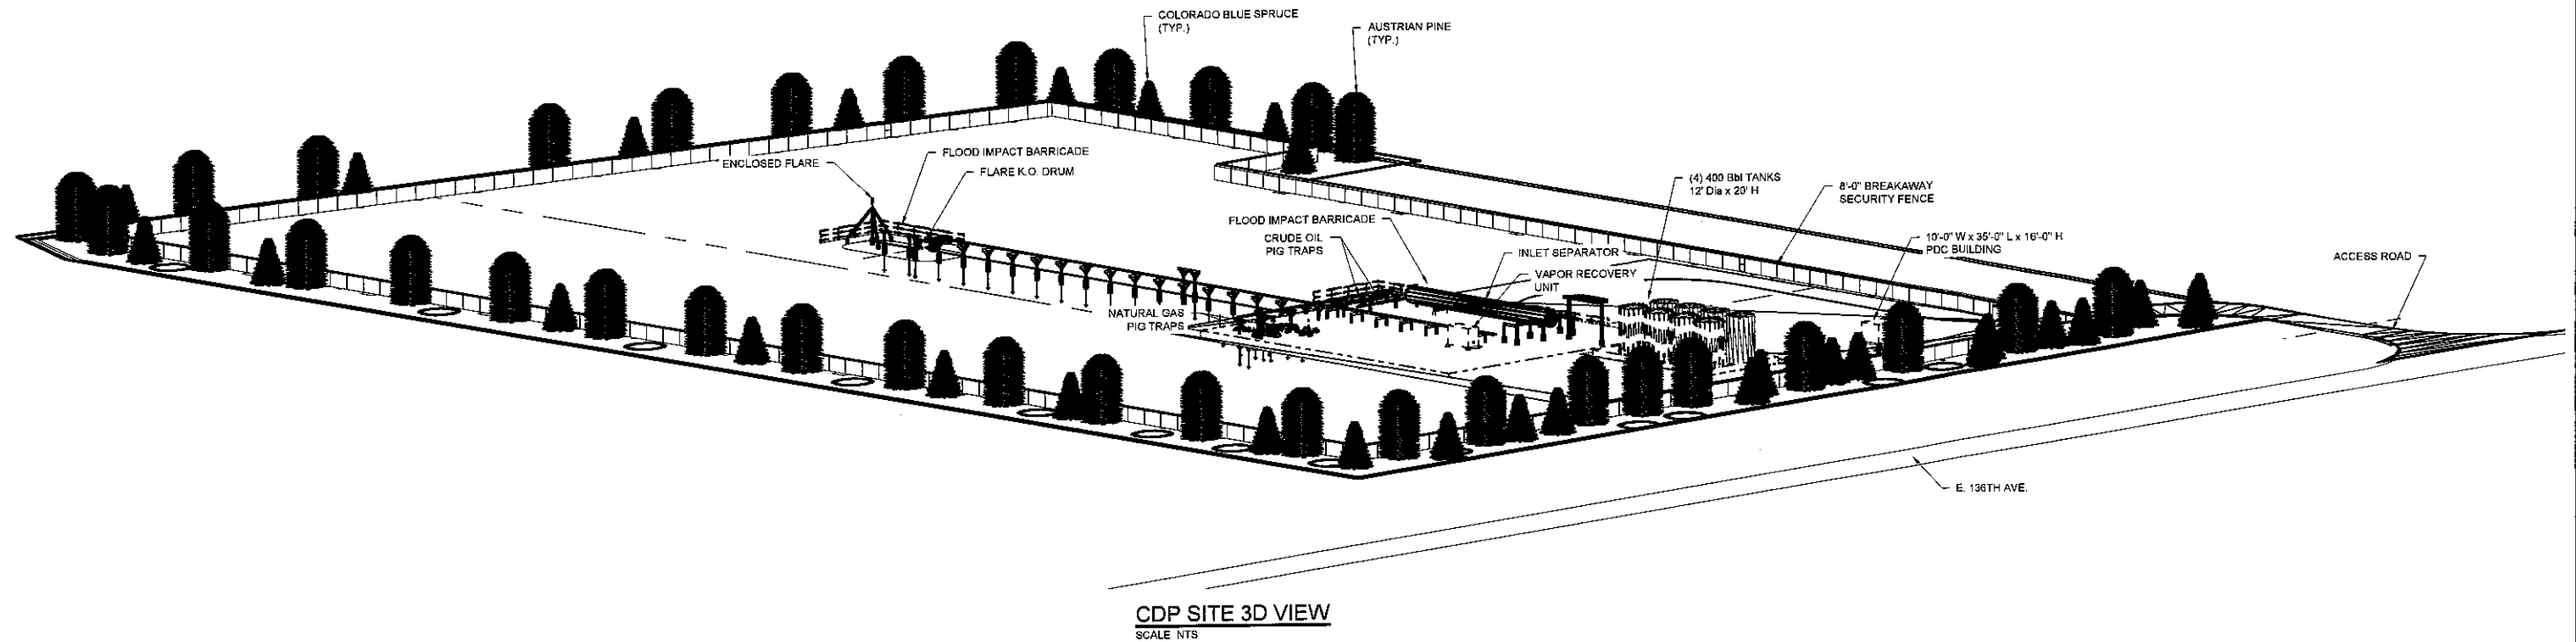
EXHIBIT soneCDP FACILITY LANDSCAPE PLAN
